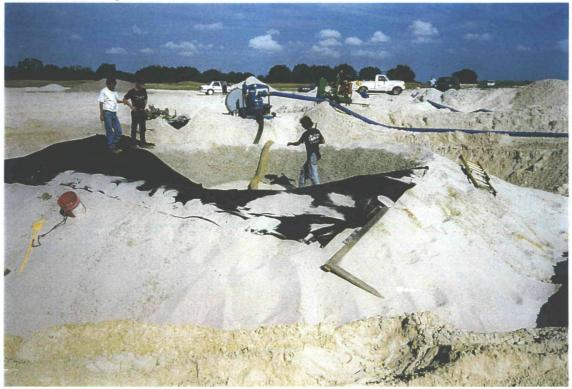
ERC installed the pump access pipes and extended the existing leachate collection pipes to the vault.
